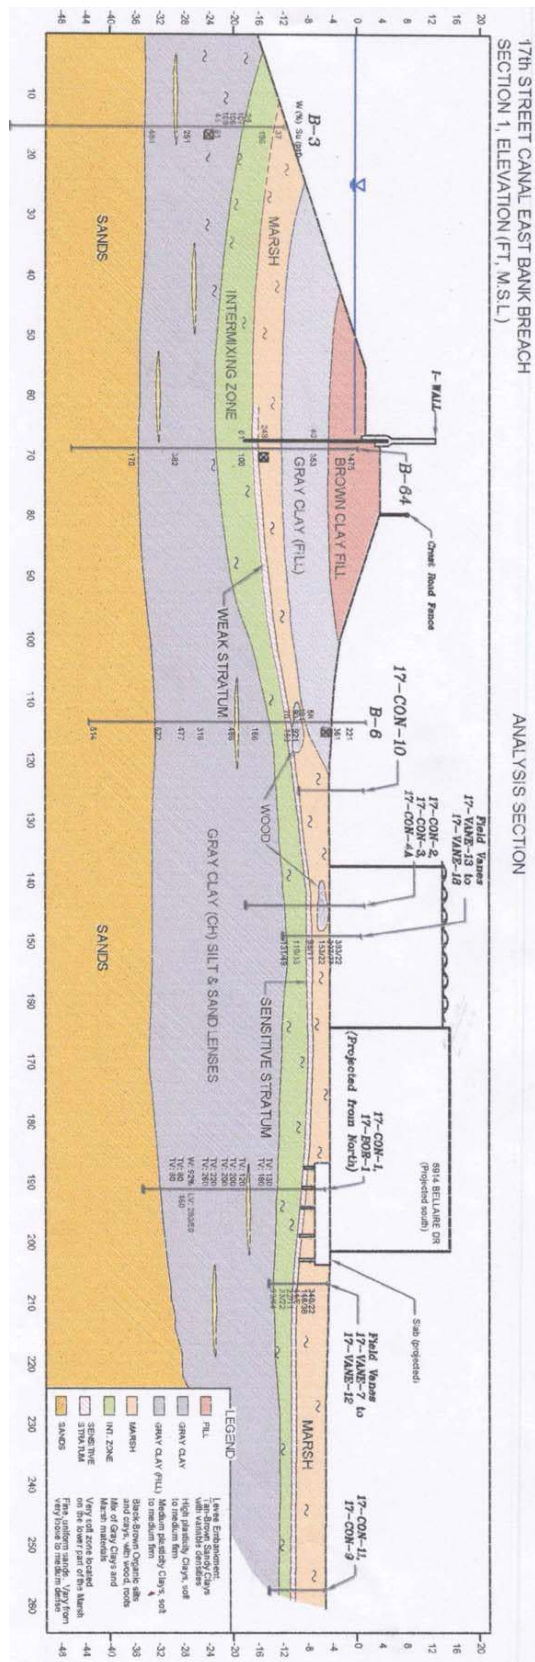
The cross section of 17th street flood wall and its foundation according to the Team (2006).
